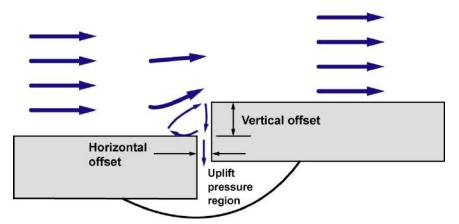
Development of spillway stagnation pressures (Reclamation).
